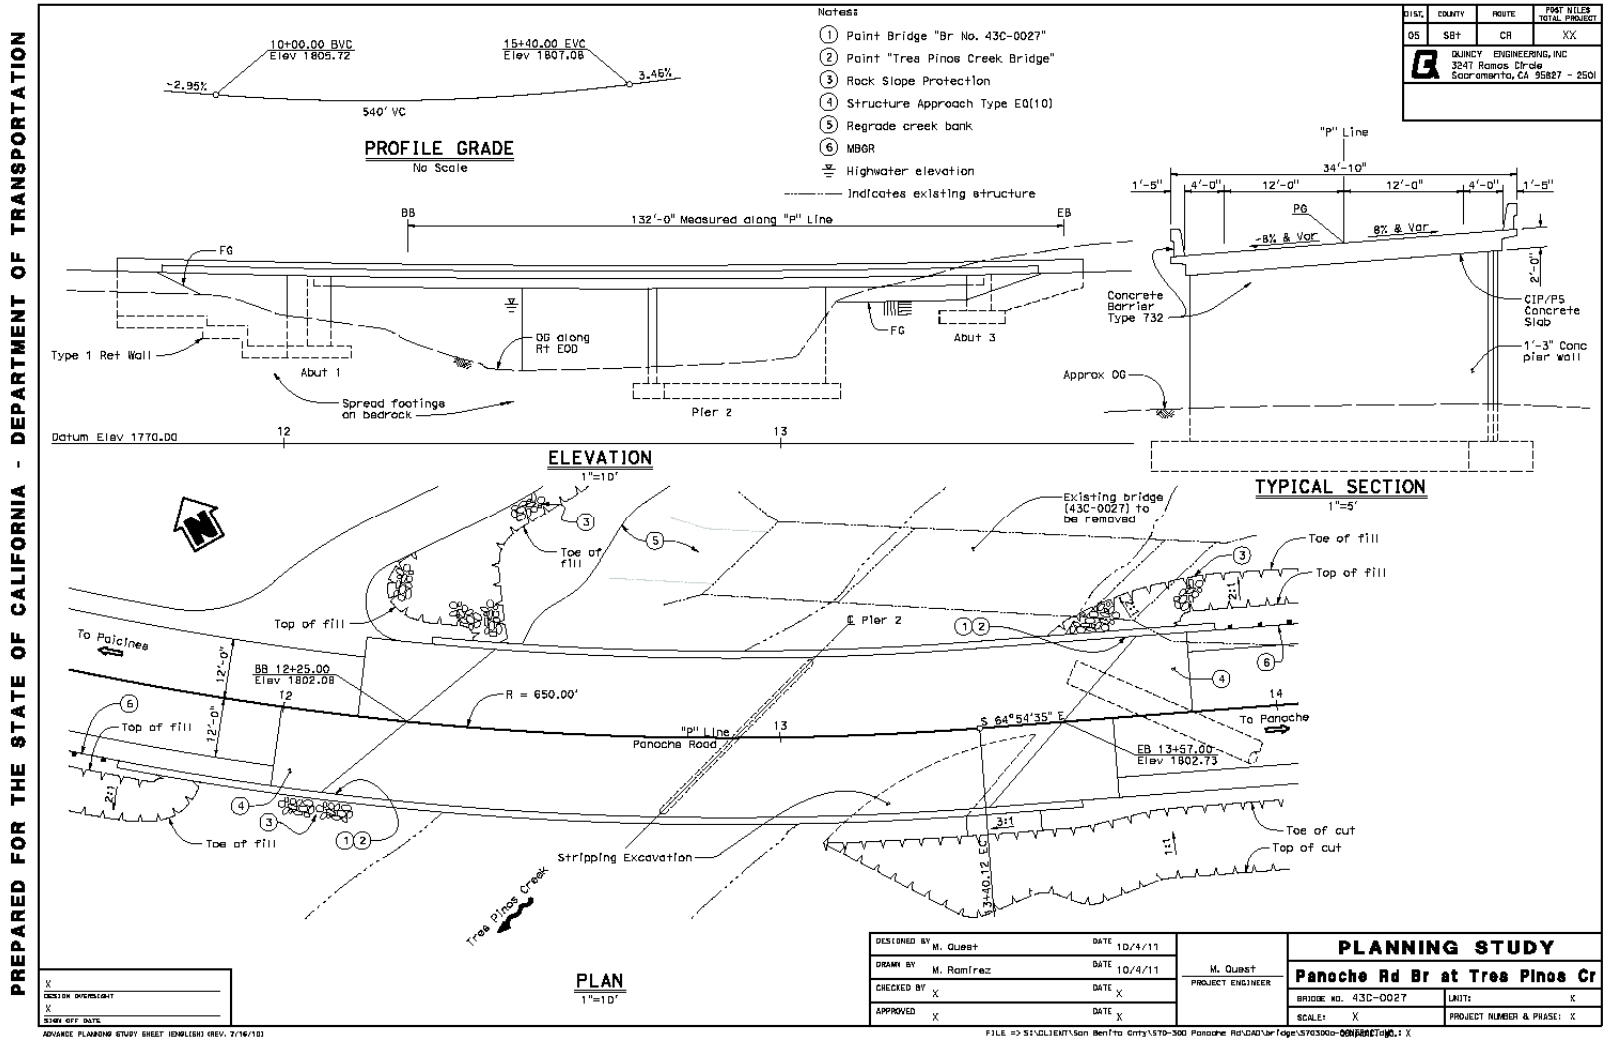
Proposed Panoche Road Bridge Replacement Planning Study
